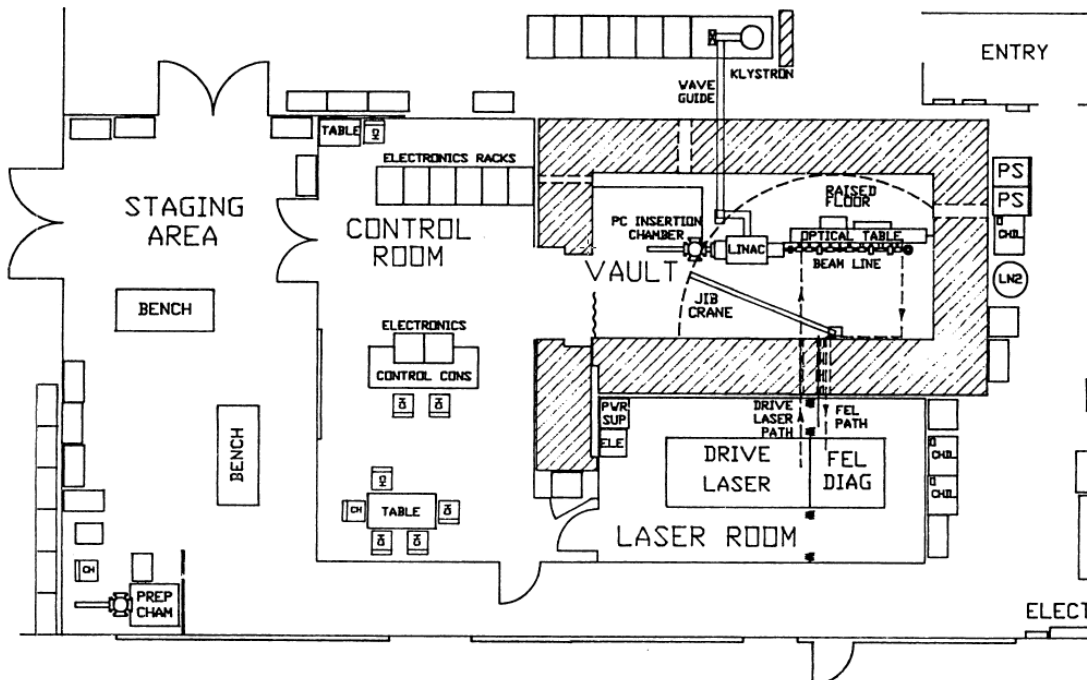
Floor plan of the AFEL Facility in Building 14.
